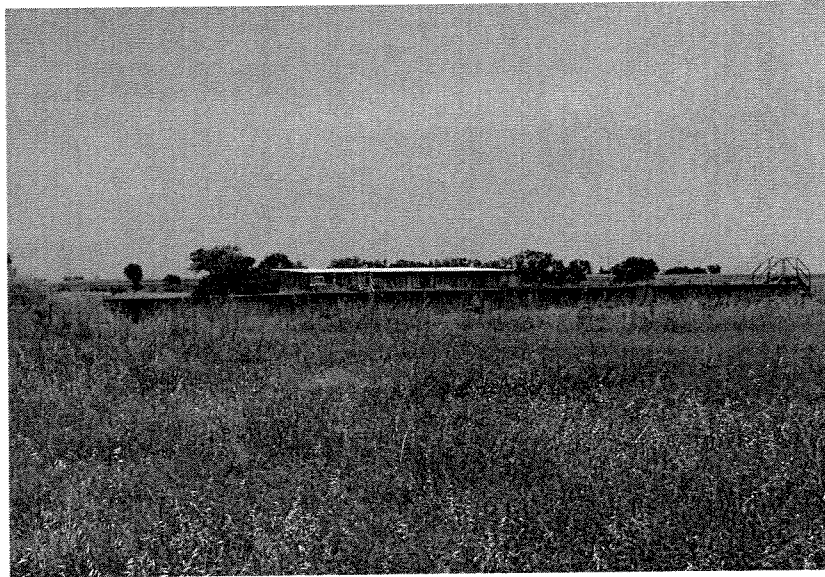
Liquid Hydrogen Tank at Test Stand No. 3 (Unit 136), foundation remnants, Beta Test Complex, 1963-1964. Test control center in background. Looking southeast. View of May 2005.
